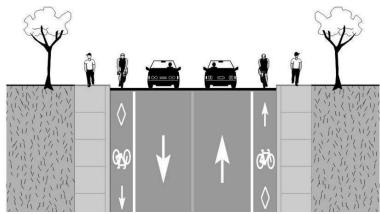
Typical Bike Lanes (Source: Halton Hills Cycling Master Plan Final Report)
